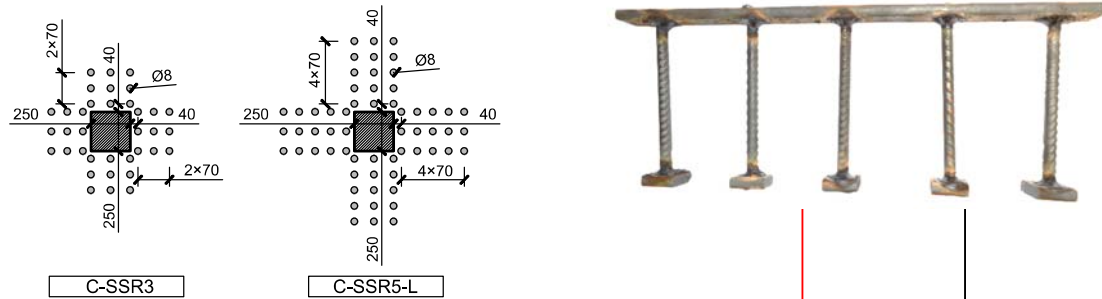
Layout of studs in specimens C-SSR3 and C-SSR5-L and the side view of a set prepared for the 5 layers layout
